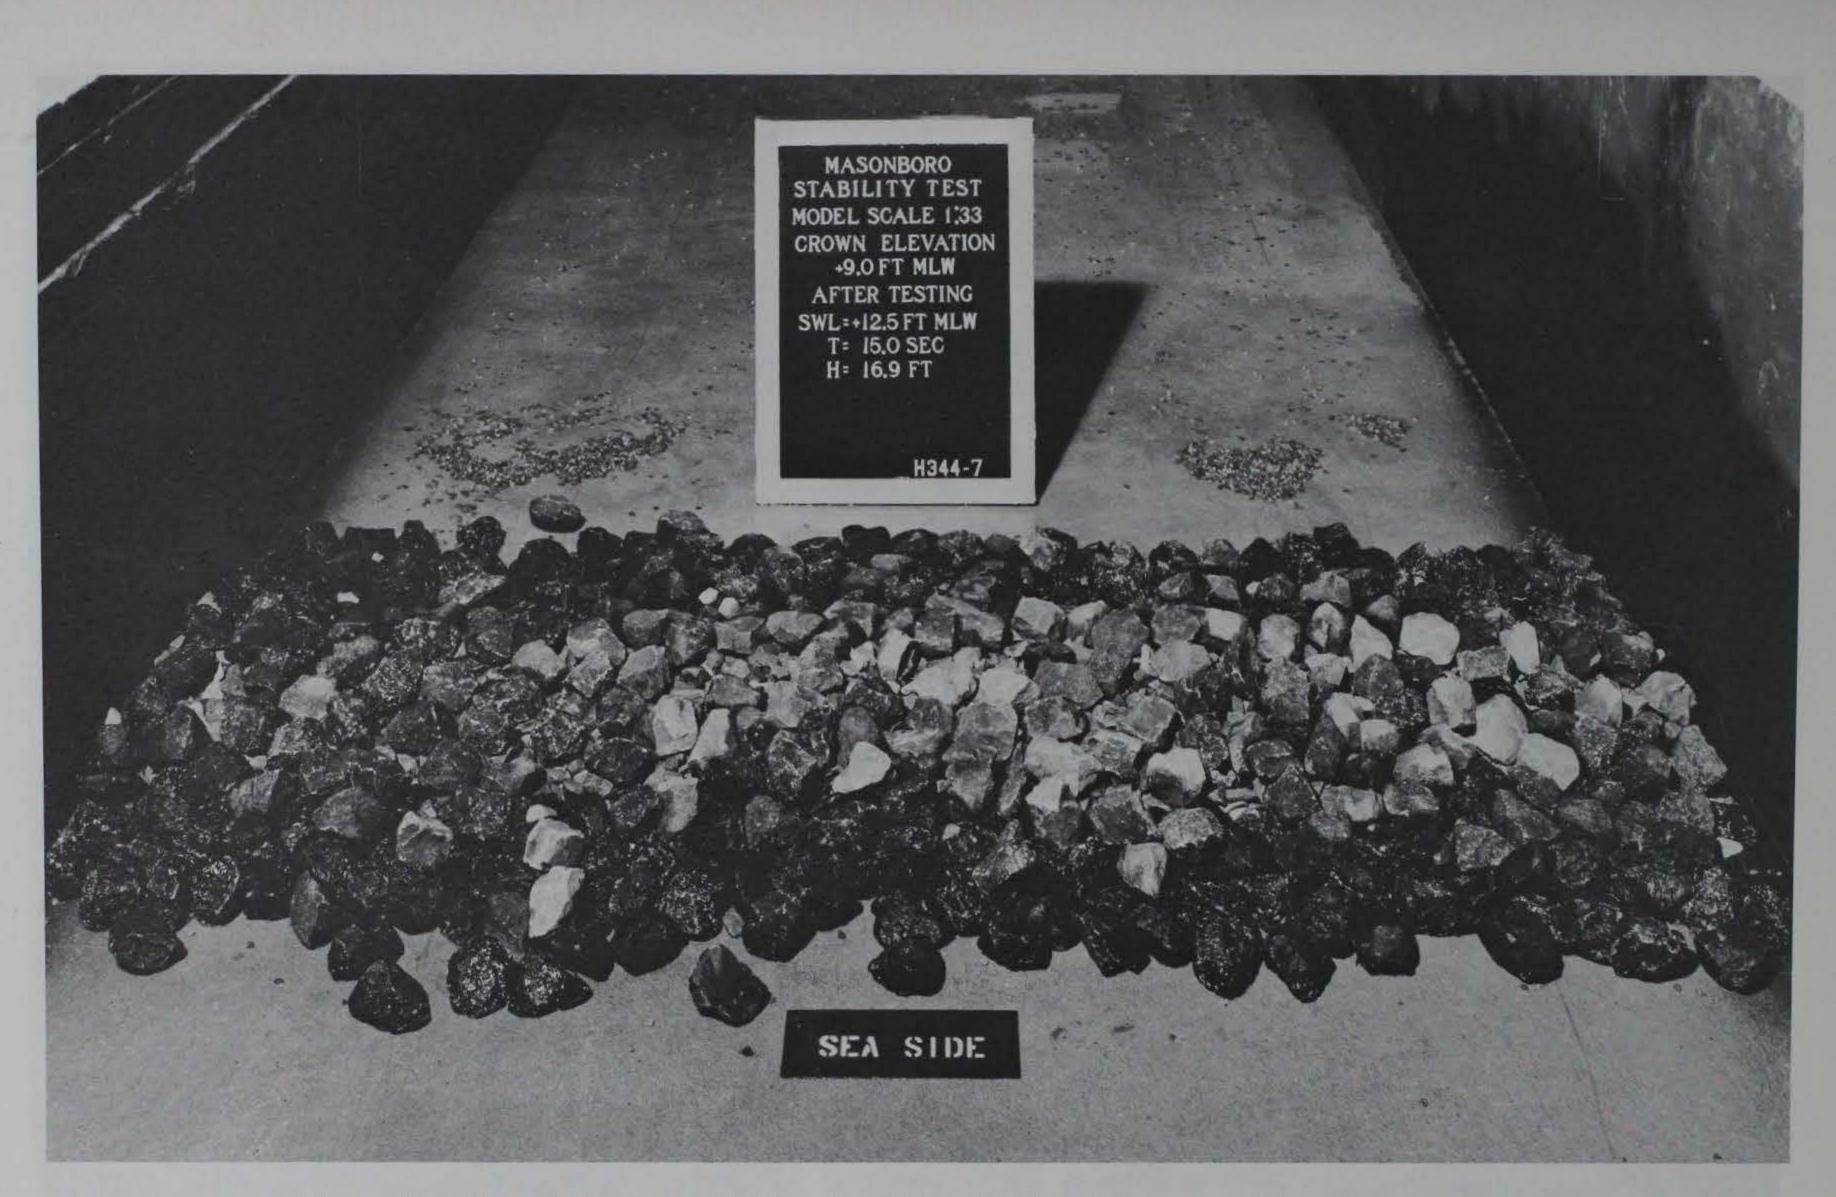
Sea-side view of Plan 2 after attack of 15-sec, 16.9-ft waves at an swl of +12.5 ft mlw for 2 prototype hr
